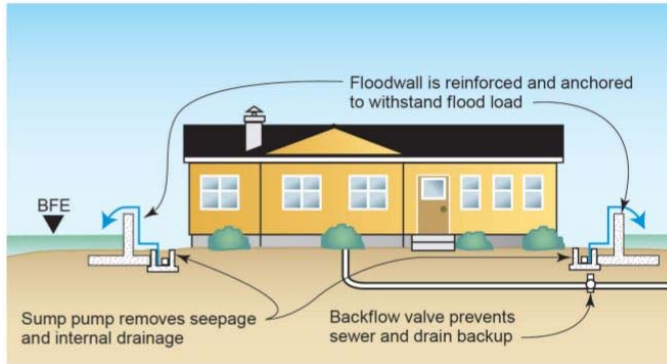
Building floodwalls around houses, and installing backflow valves and sump pump drainage. (Source: FEMA P-1037)
